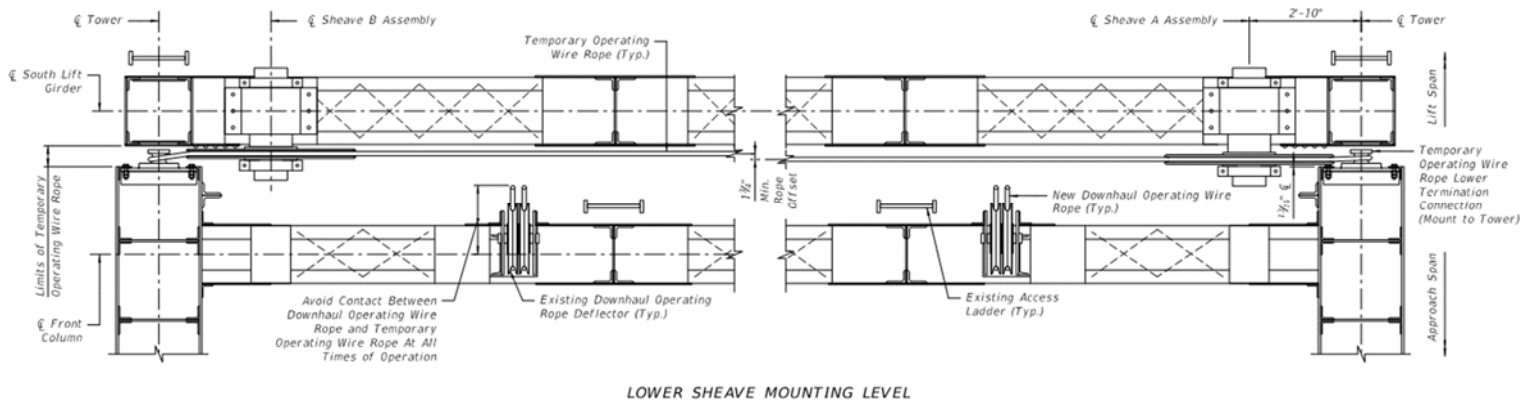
Plan View at Open Joint, Lower Temporary Sheave
